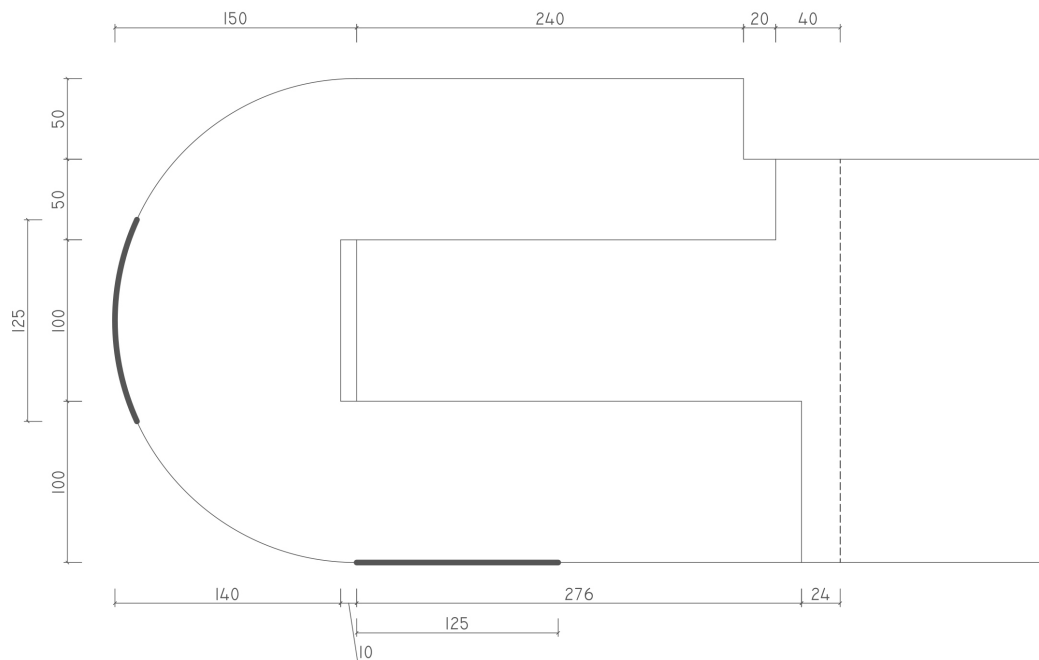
Dimensions [mm] of the of the used heel joint.
